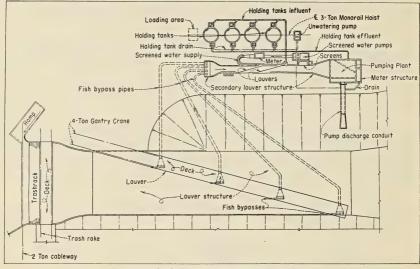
Sketch plan -- Tracy Fish Collecting Facility.
